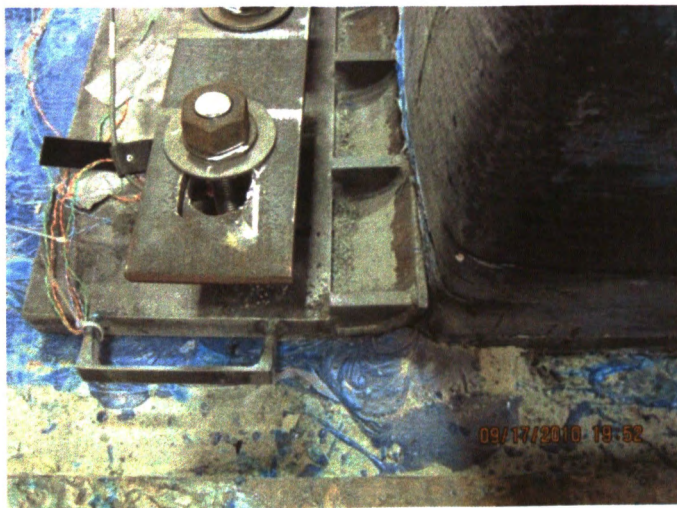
Failure of Column #1 by Rupture of CFRP at Anchorage
